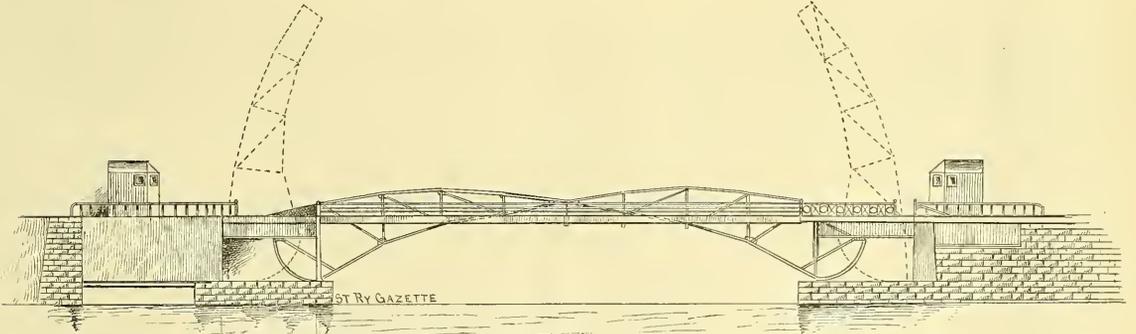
ROLLING LIFTING BRIDGE OVER THE CHICAGO RIVER.
